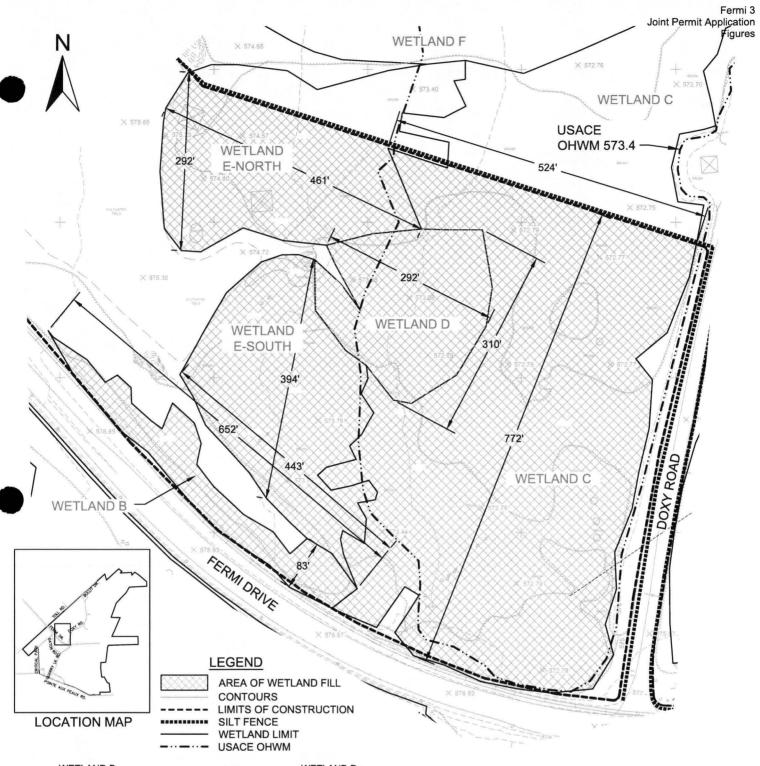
A CONSTRUCTION AREA 3 PLAN VIEW A
